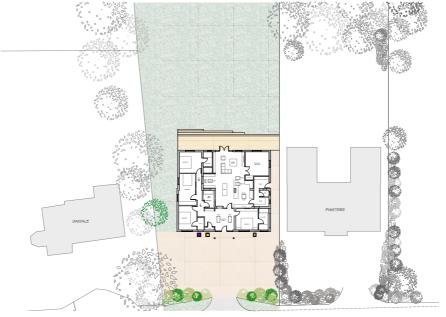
Proposed Floor Plan (Kingsmede)
